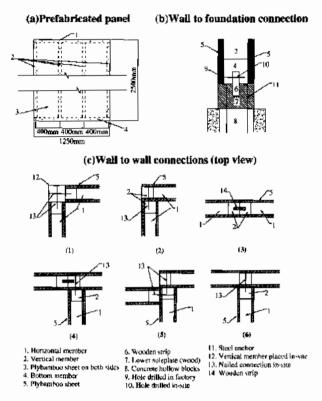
Design method B. Wall and connection details. Dimensions in mm.
